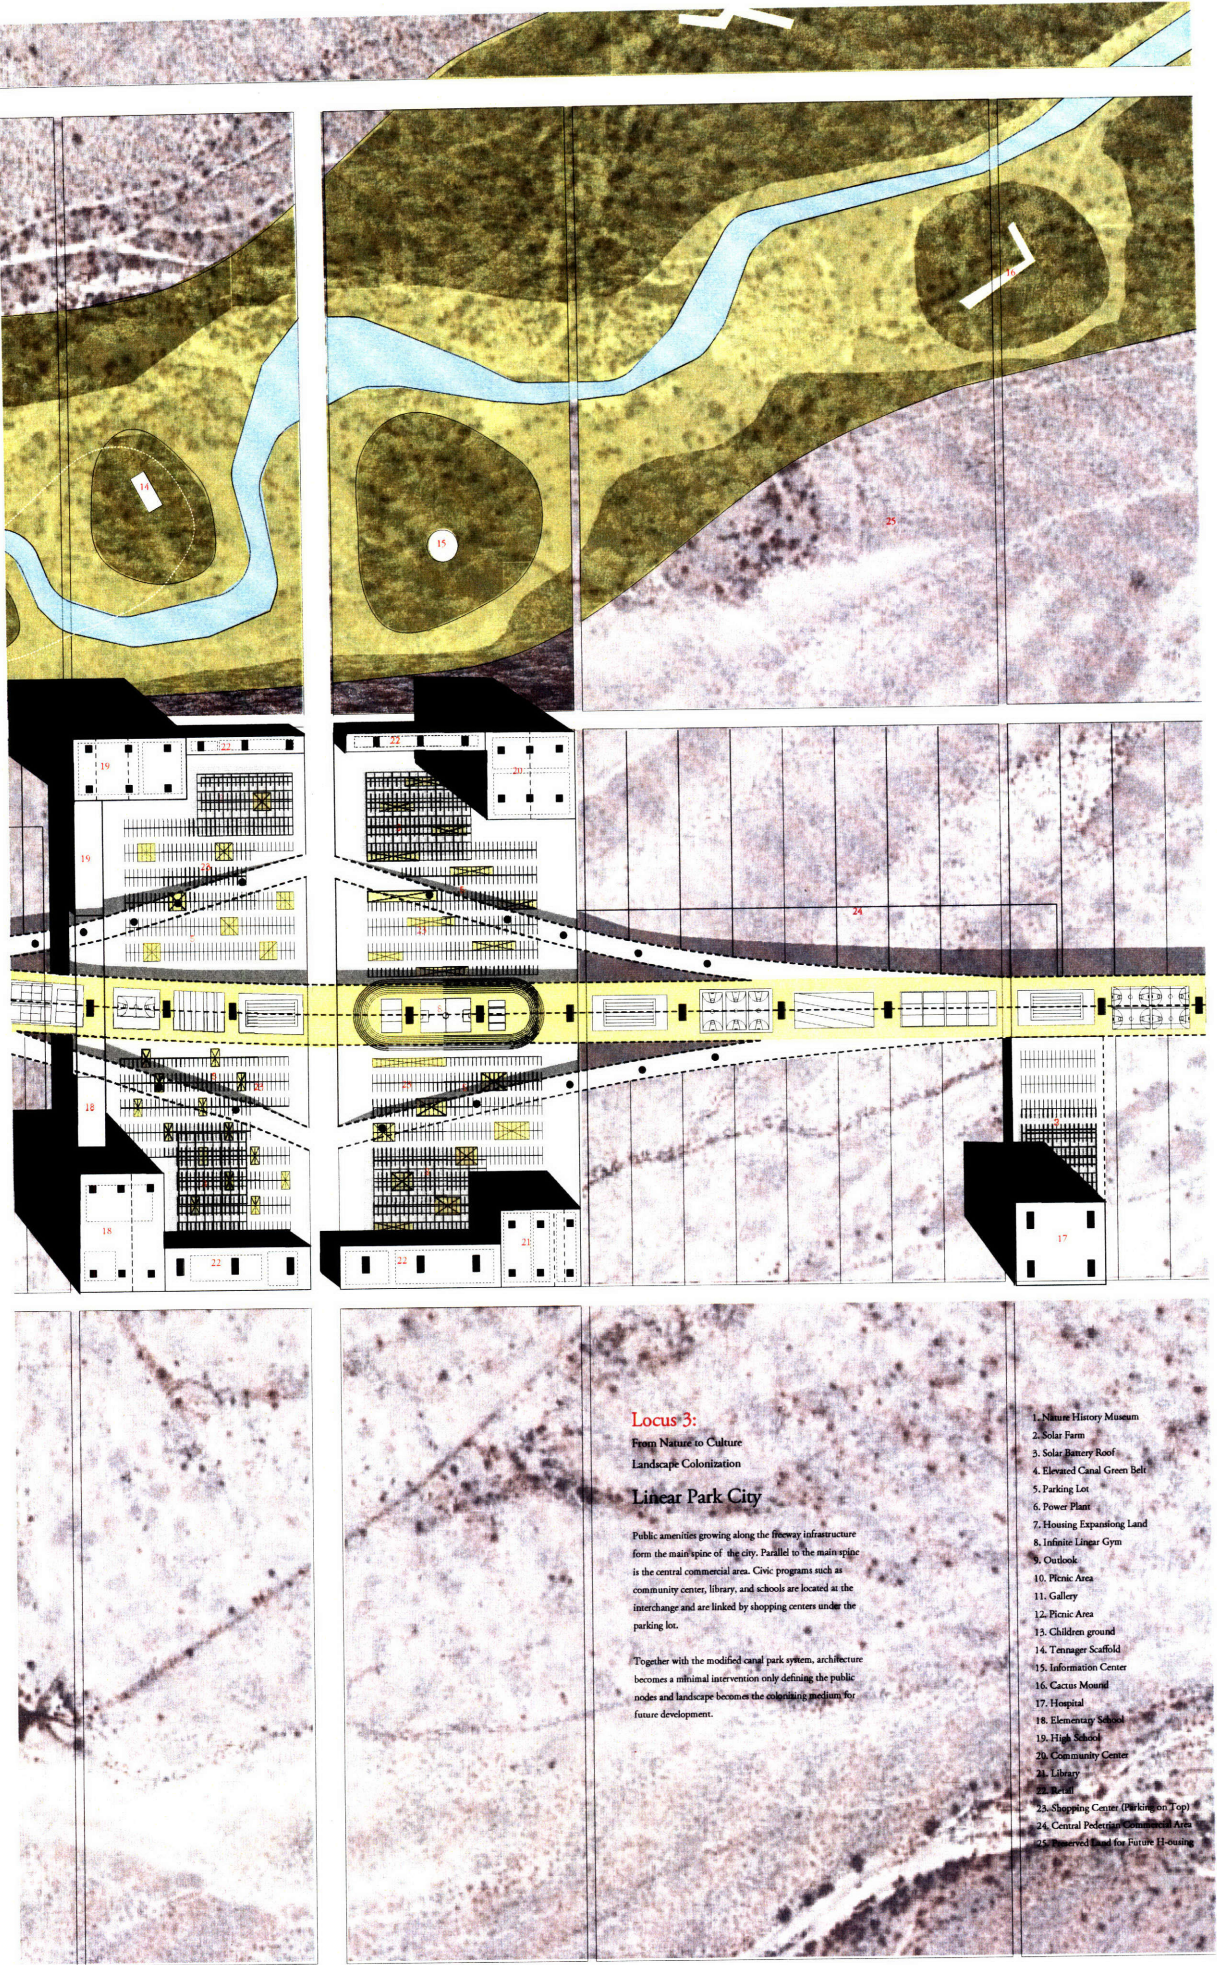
Plan of the Linear Park City. Tien-Yun Lee, 2008.
